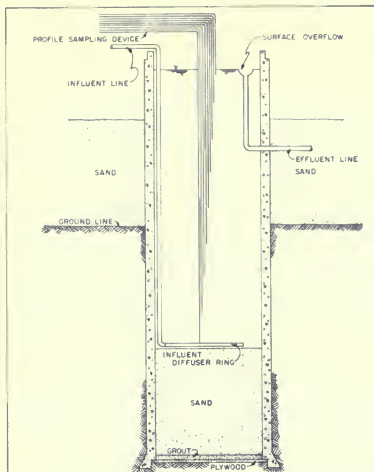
SCHEMATIC OF A CONCRETE PIPE INSTALLATION
